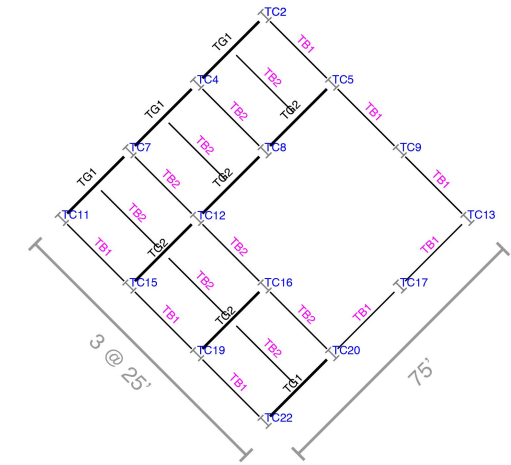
Typical floor framing at Tower Units 2 and 3.
